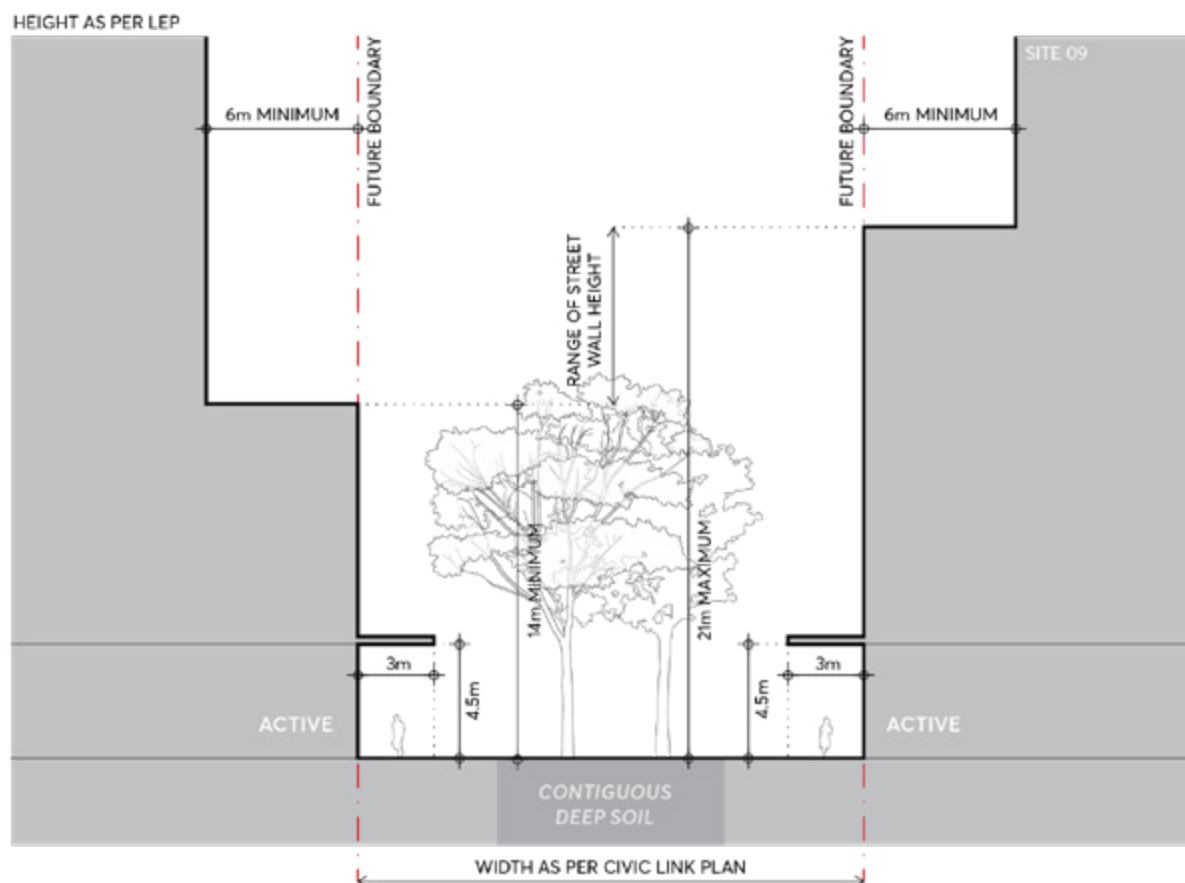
Future Civic Link in Block 3 (Section H) Setback & Building Height
